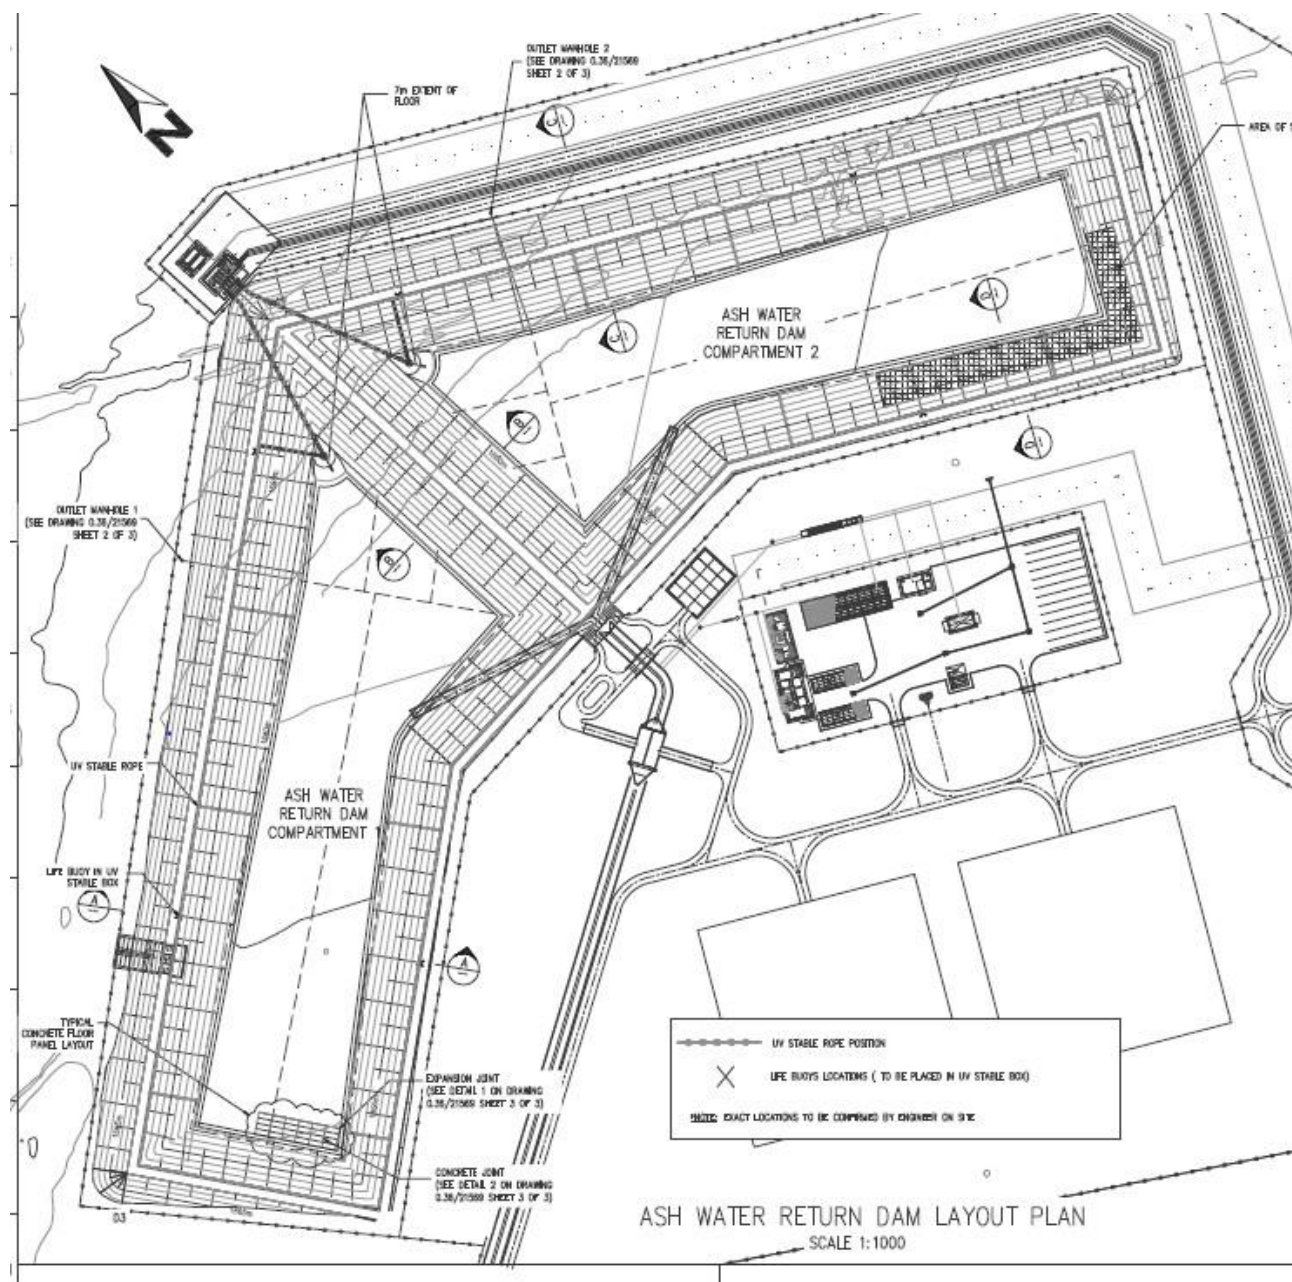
Ash Water Return Dam Compartment 1&2 Layout Plan
